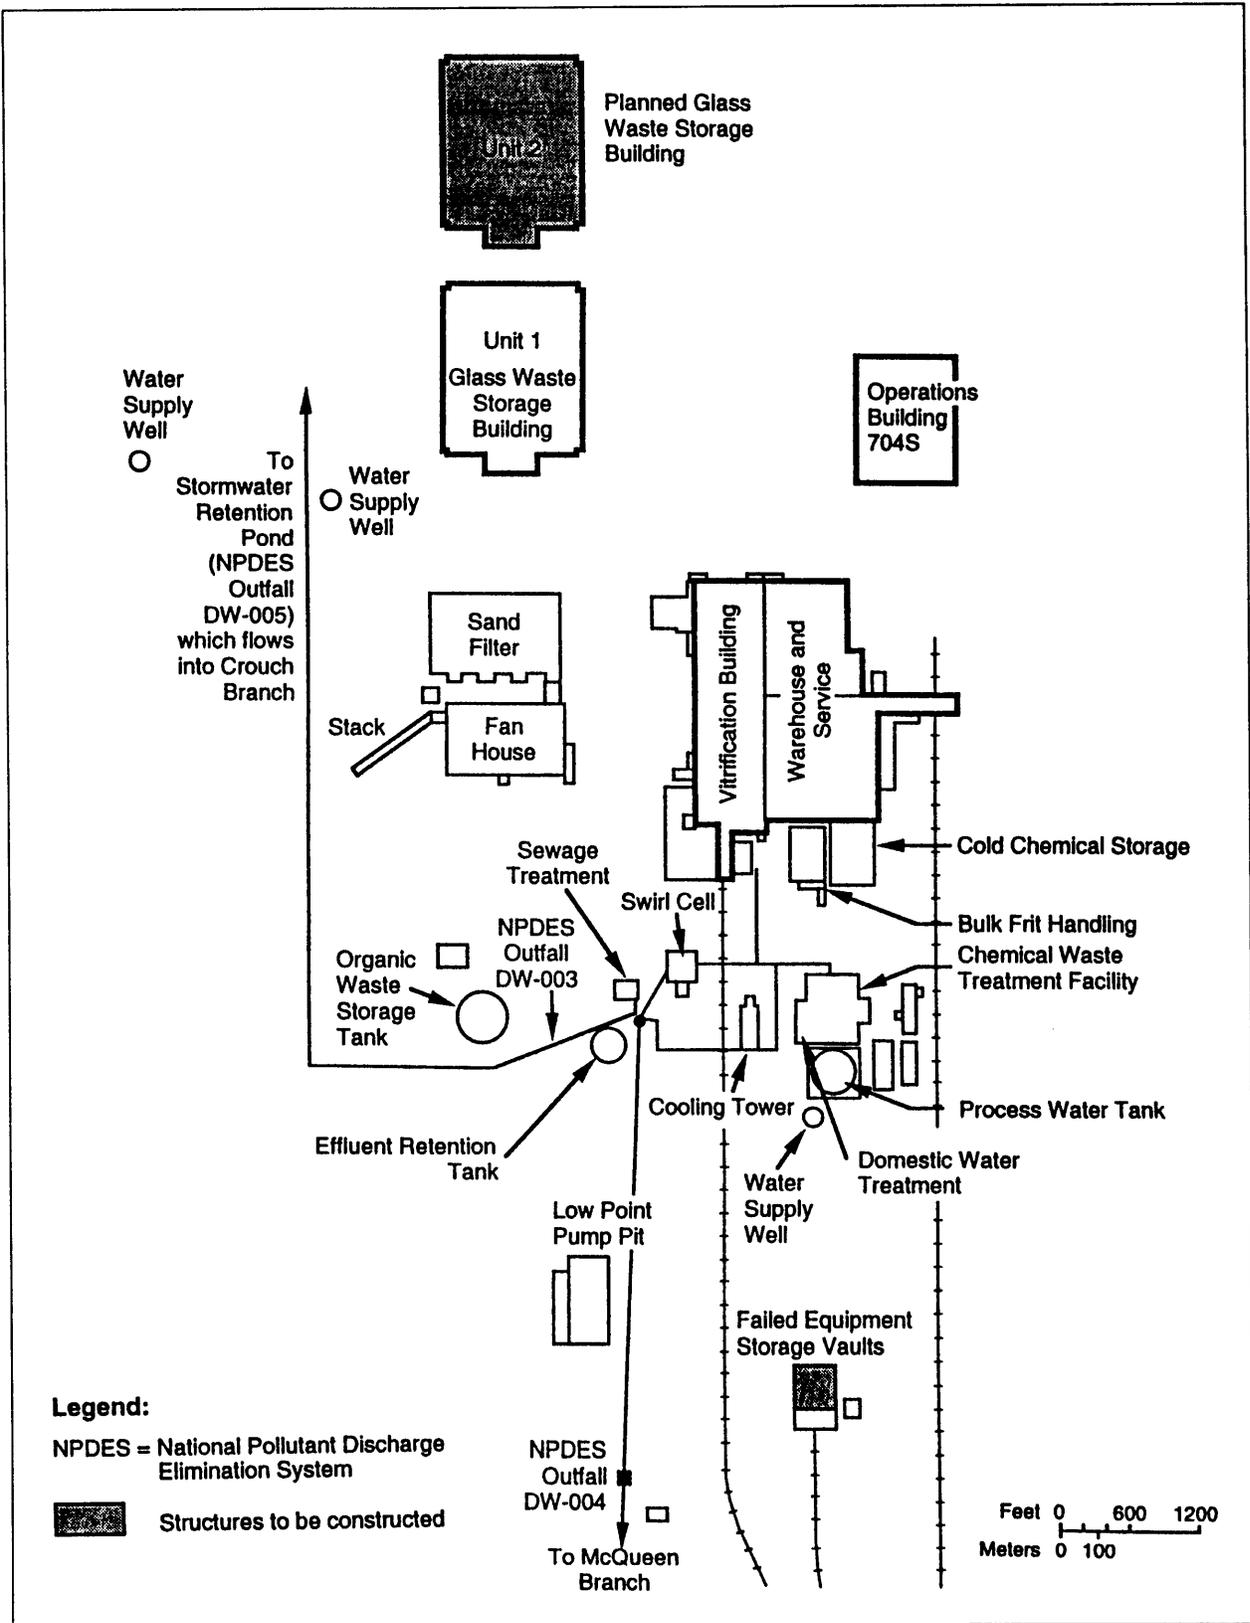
General Layout of the Existing Vitrification Facilities at the Savannah River Site
